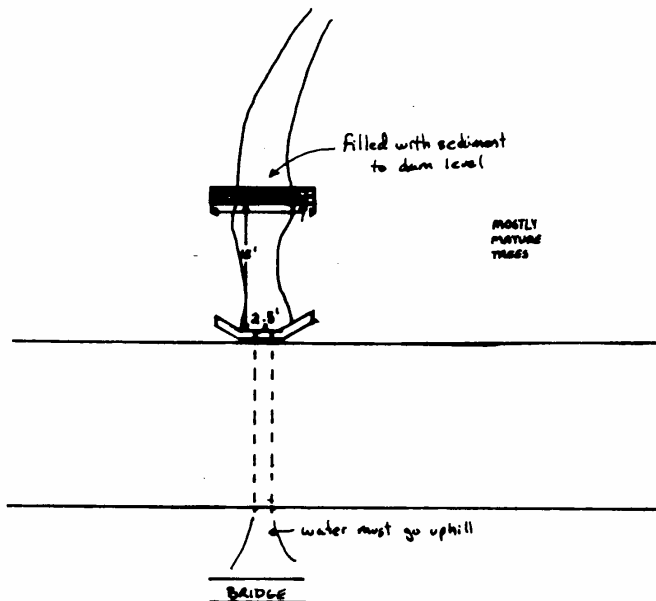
(b). Plan view of check dam and surroundings at Site 2.
